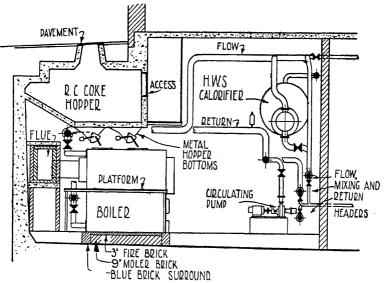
(b).—Cross-section of Fig. 56 (a).
